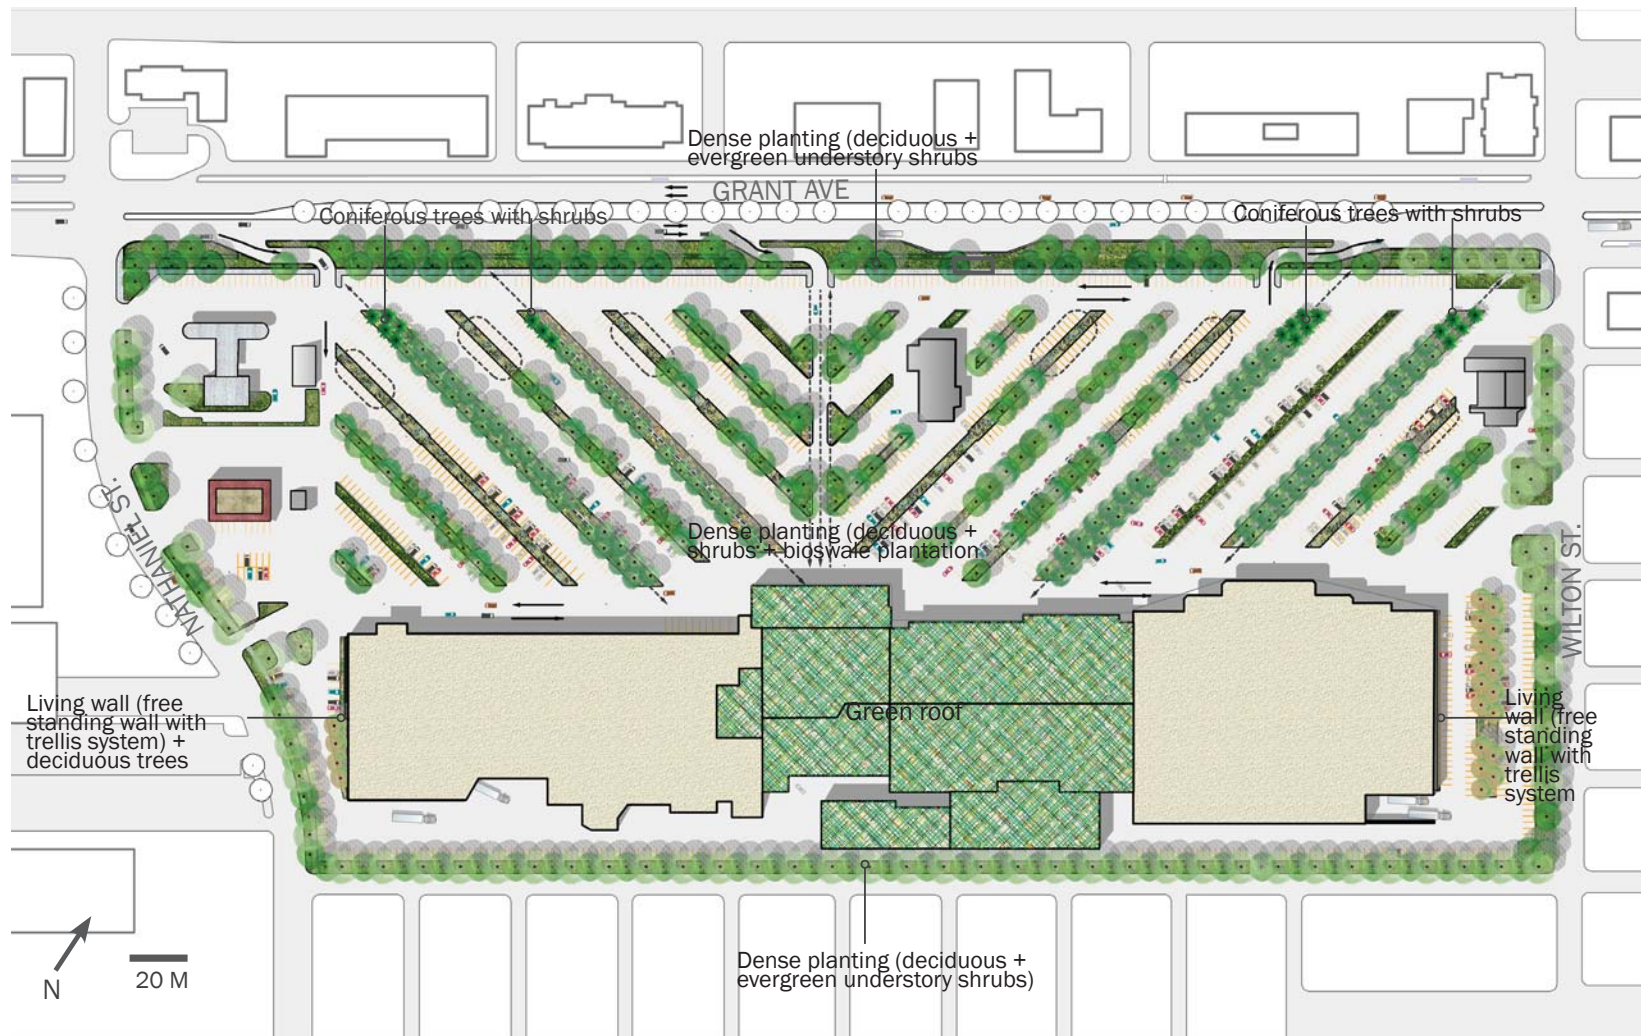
Site Plan - Proposed planting design around the building can reduce energy consumption in the building and provide comfortable exterior space.
